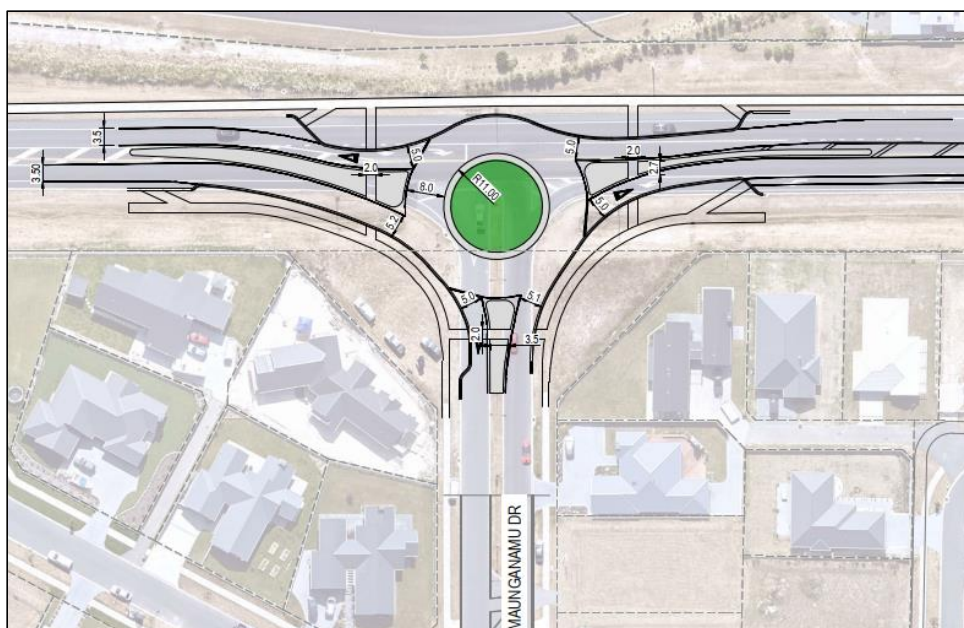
Concept layout of 3-leg option for Maunganamu Drive roundabout
